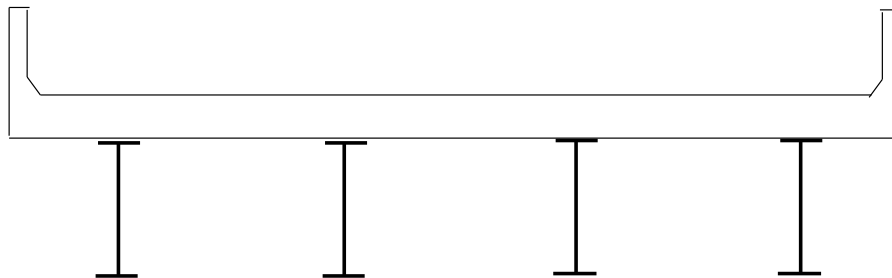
Cast-in-Place or Precast Concrete Slab Supported by Steel Beams.
